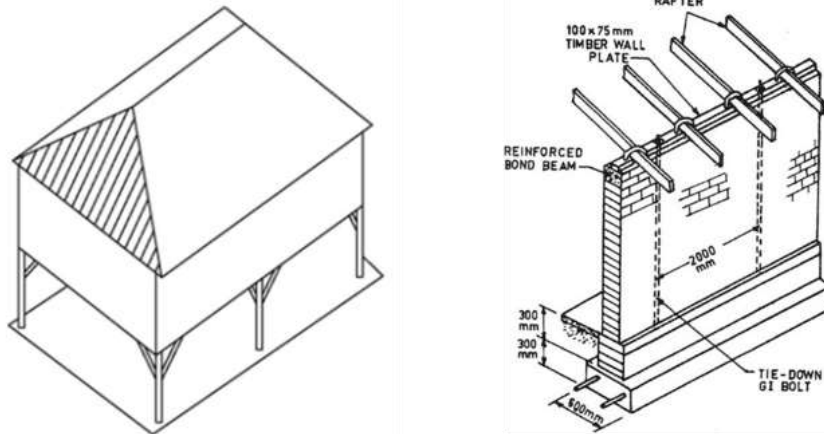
Stilt construction for better stability & fixing of walls to the foundation
